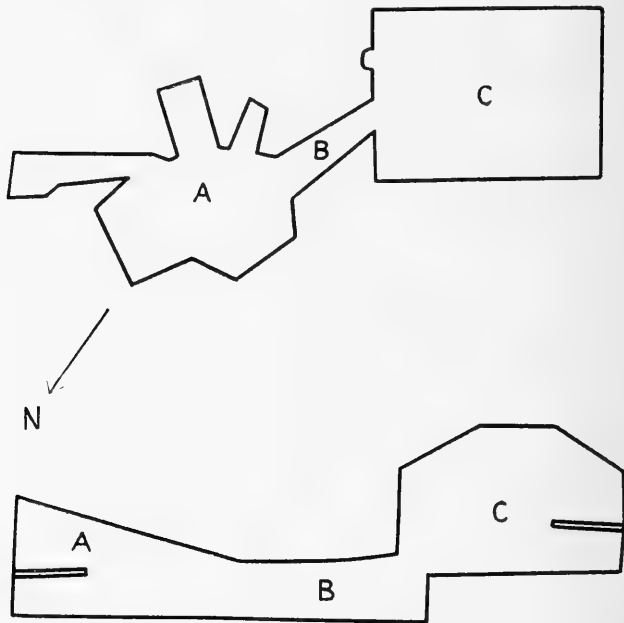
Outline of floor plan and profile of Eskimo house at Metlatavik, Bering Strait.
